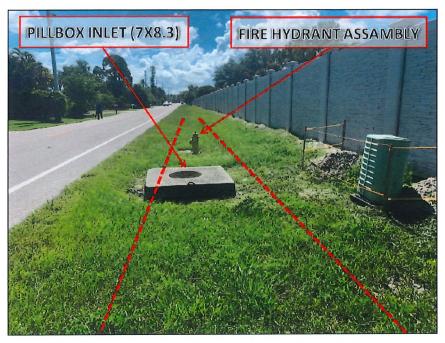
91st Avenue N and 8th Street N Sidewalk Alignment and Drainage (East)
